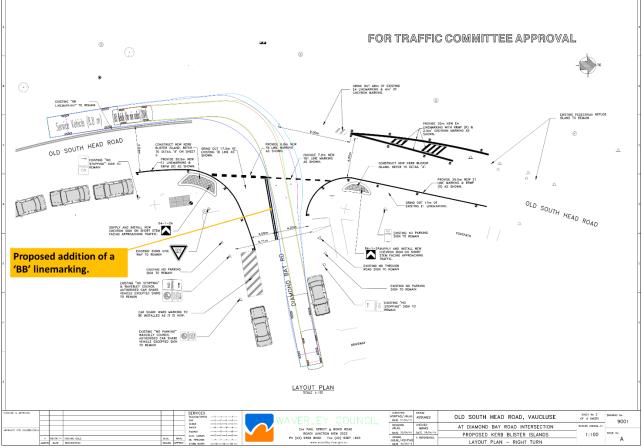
Proposed addition of a 'BB' centreline at Diamond Bay Road.
